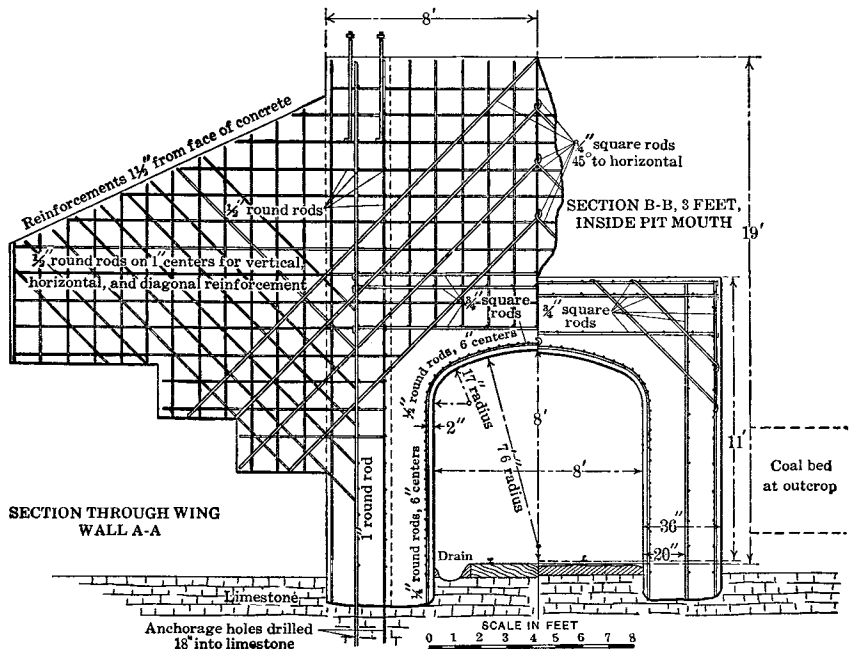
Cross section of reinforced-concrete portal of experimental mine.
